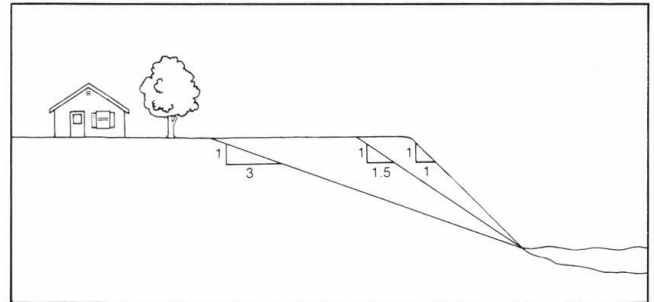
The maximum slope for vegetative stabilization projects is 1-foot vertical rise for each 1.5-foot horizontal run (a 1:1.5 slope).
